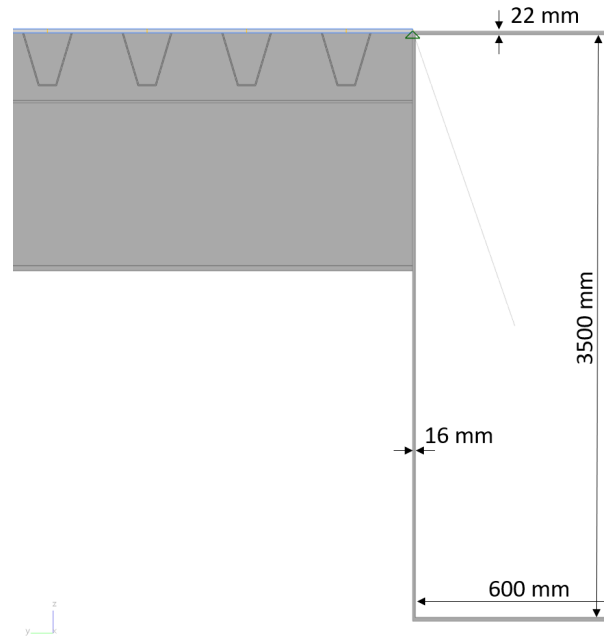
Cross-section of a main girder with dimensions as used in the FE model.
